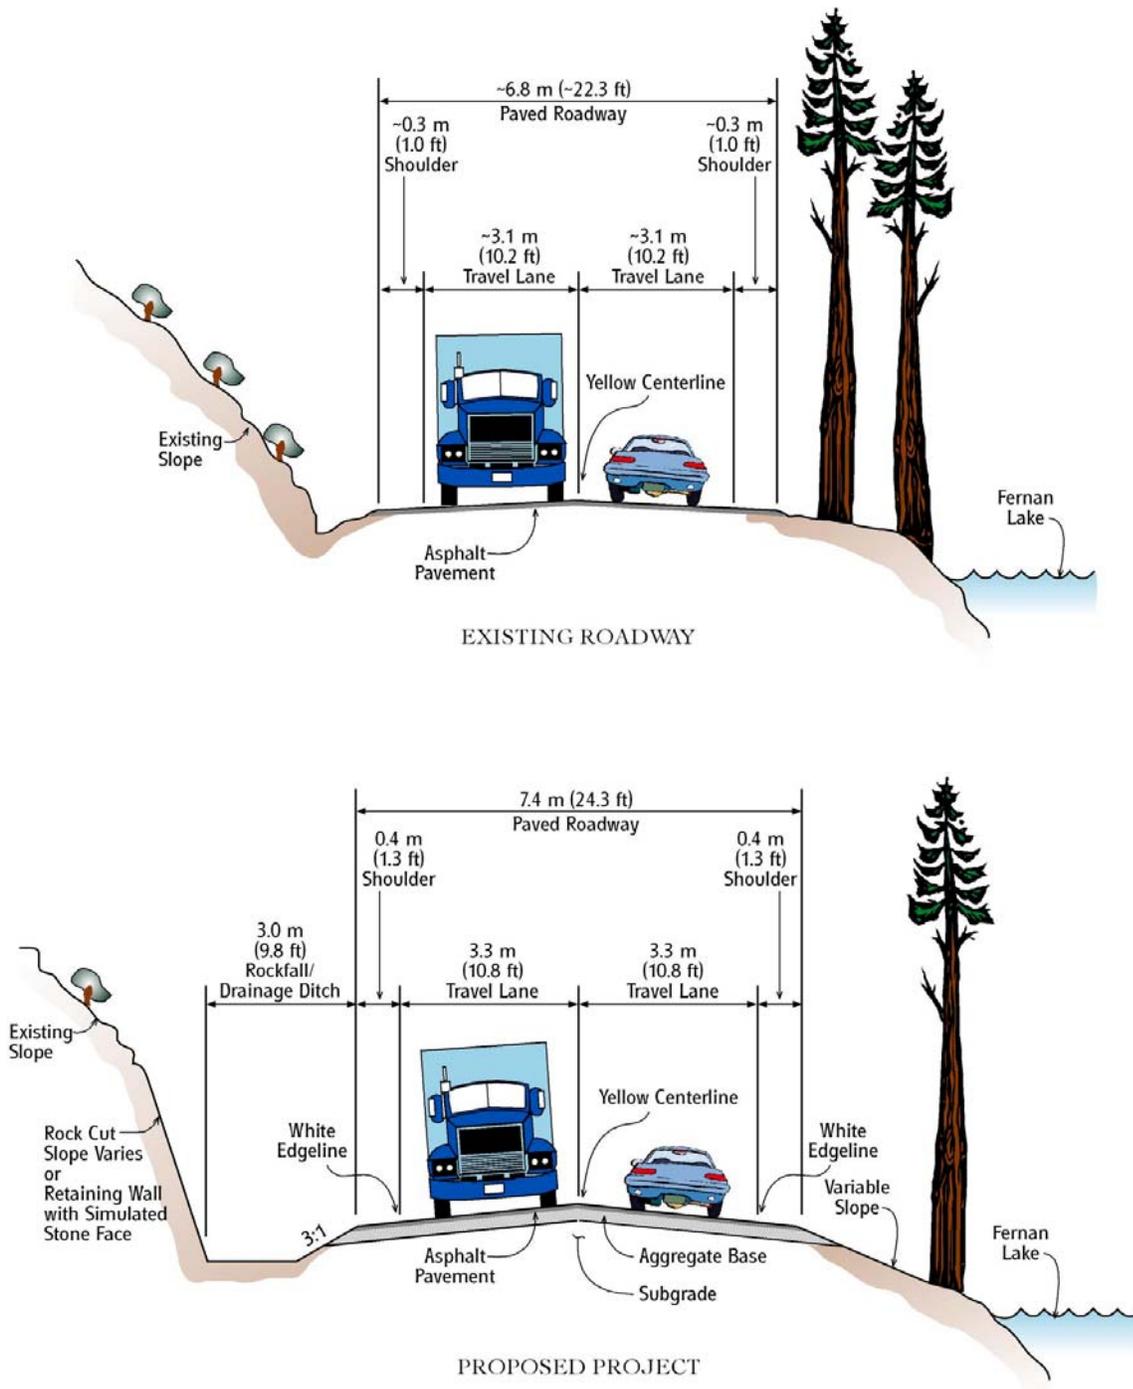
Schematic Cross-sections of Existing and Proposed Roadways in Segment 1.
